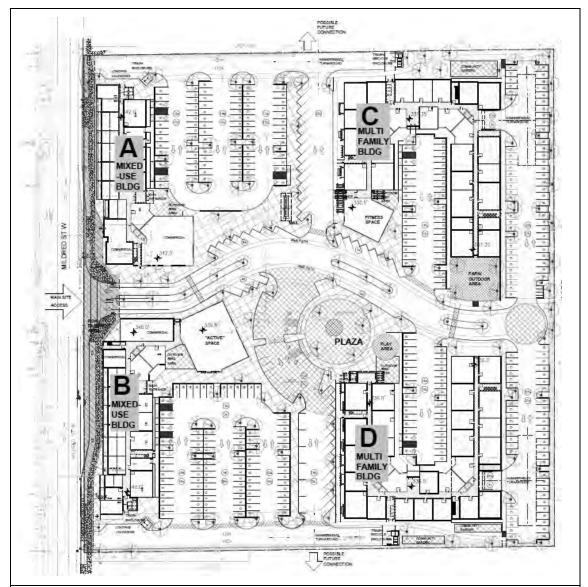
Proposed site plan modified from Sheet AS-100 of the schematic design set dated 5-20-22, prepared by Graves + Associates. (North is to the top of the plan)
